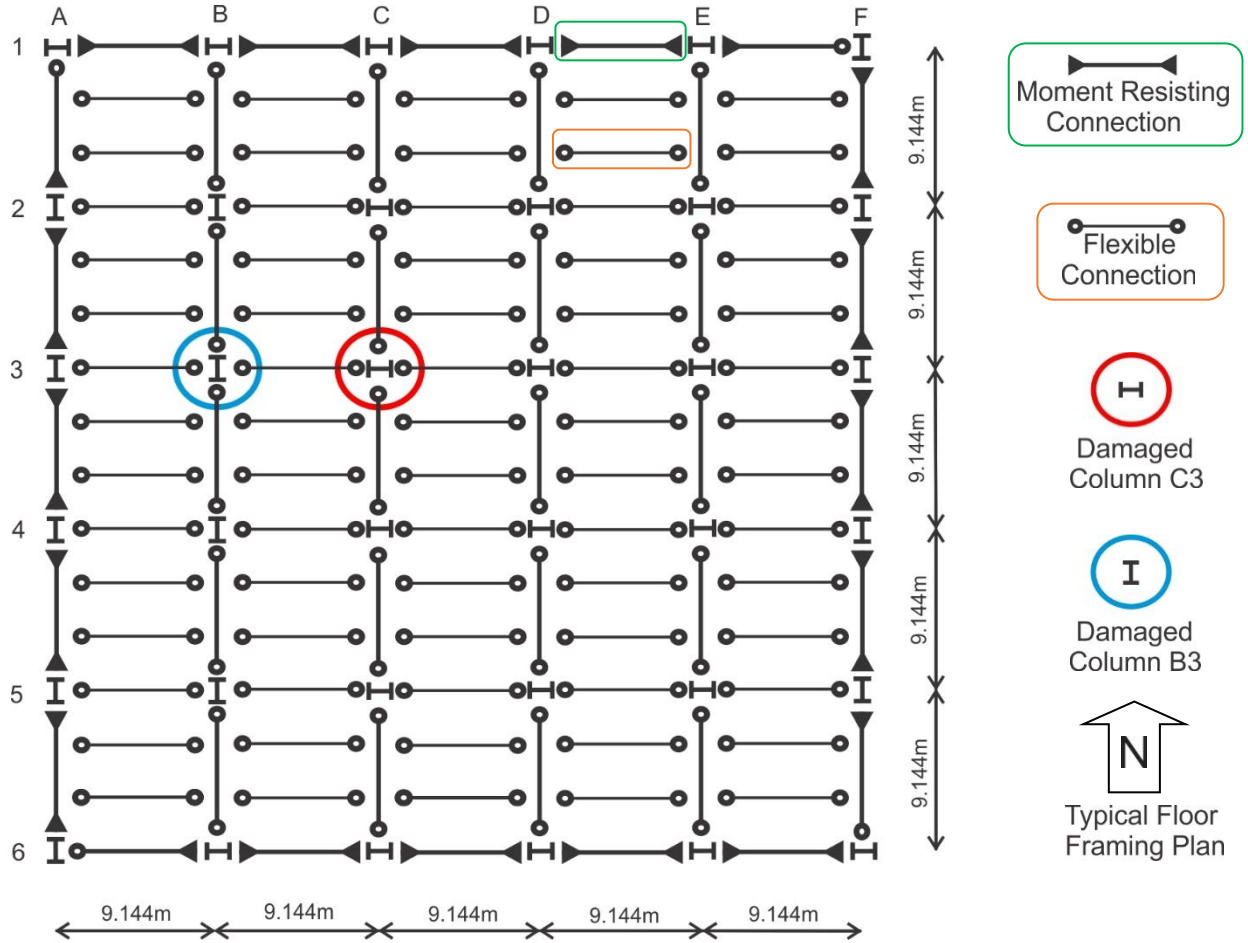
Plan view of the Boston North Pre-Northridge 10-story building. Highlighted columns C3 and B3 in which damage is introduced
